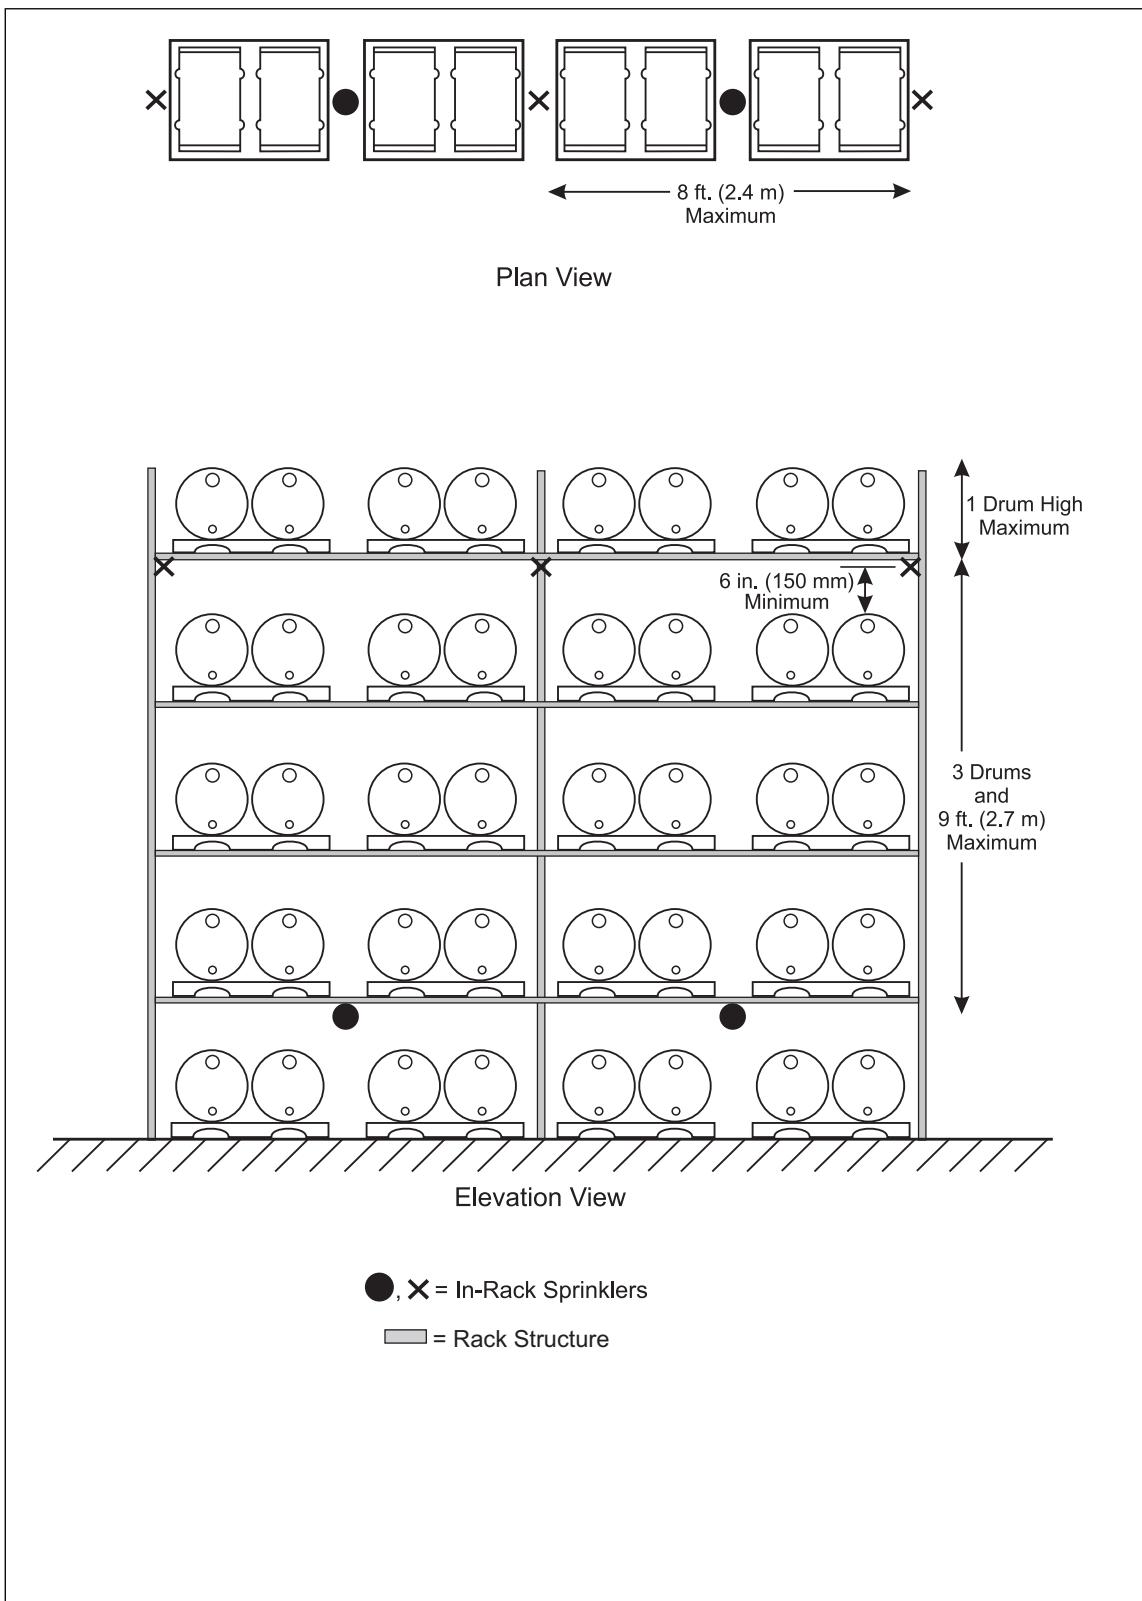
Single-row rack sprinkler layout: drum protection scheme
